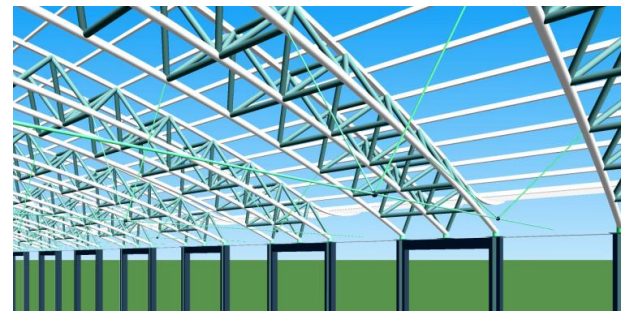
A 3D truss model showing internal components like arrangement of truss and connection between bays
